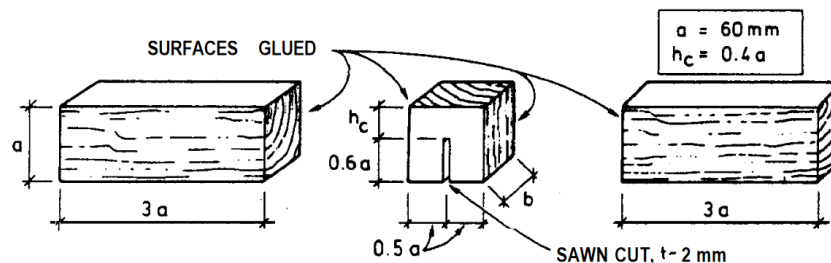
General dimensions of the test specimens (Wood: Fracture energy in tension perpendicular to the grain, 1993)
